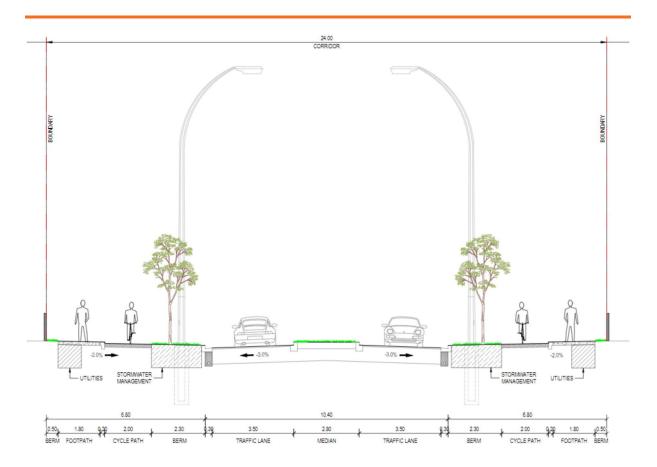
Ōpāheke Road (Rural) typical cross section (indicative)
